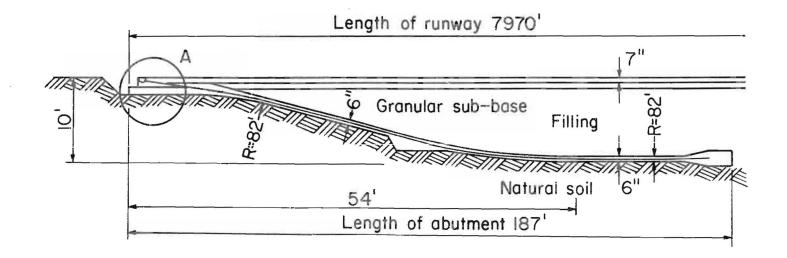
ABUTMENT FOR PRESTRESSED PAVEMENT AT BOUDRY, SWITZERLAND
